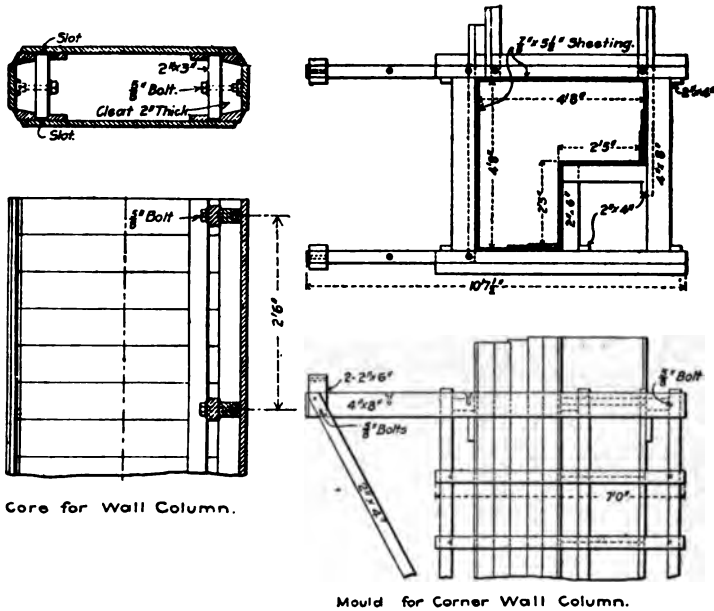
Core for Hollow Column, Kelly & Jones Factory, Greensburg, Pa.
